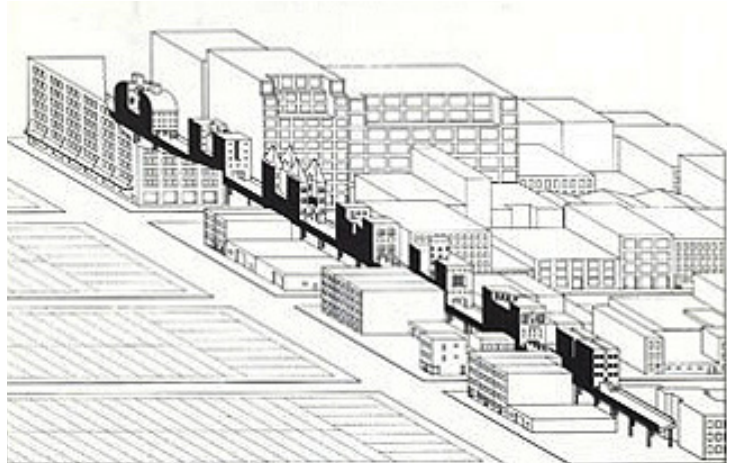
Steven Holl, Drawing of Bridge of House in Manhattan, 1981
